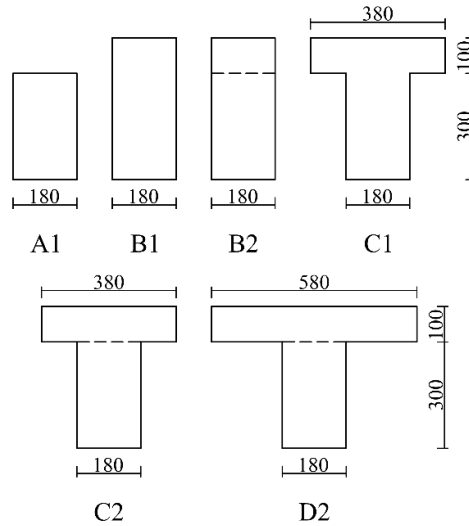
Cross-section types of the specimens without web reinforcement (dimensions: mm).
